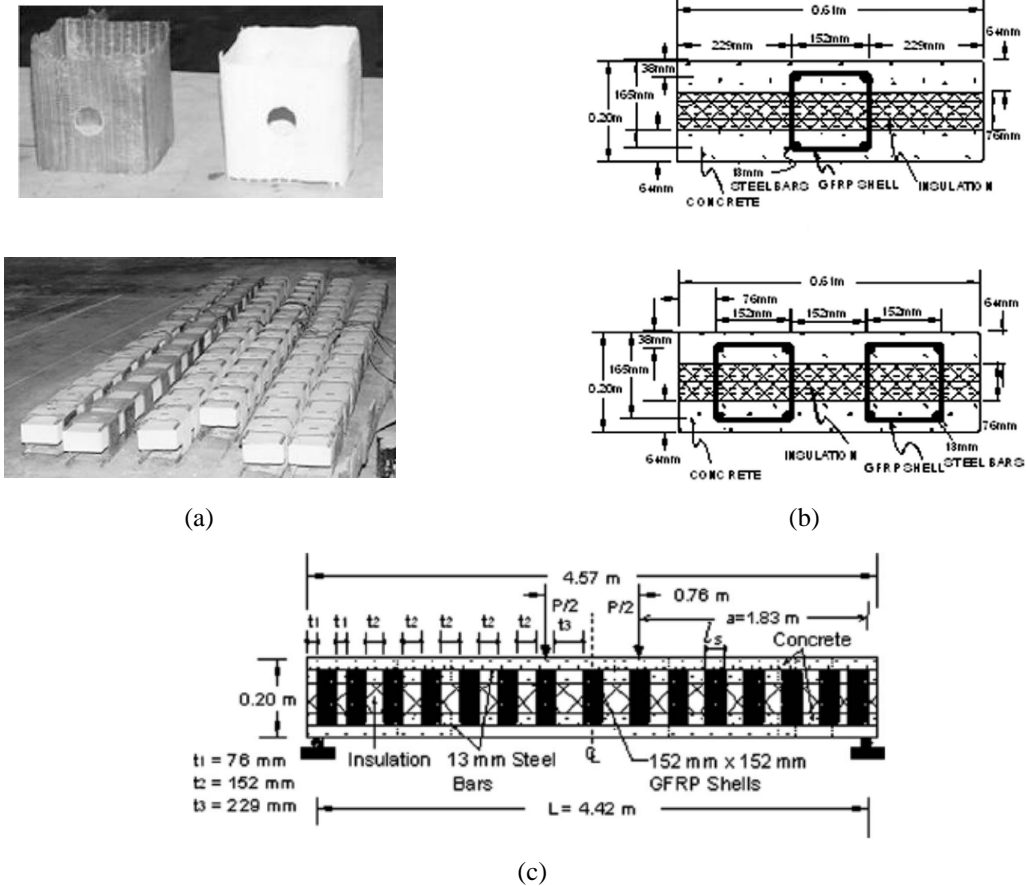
(a) epoxy-cured and urethane-cured GFRP shells; (b) cross-sectional view of single cage and double cage sandwich panels; (c) longitudinal view of panel (Pantelides *et al.*, 2008).
